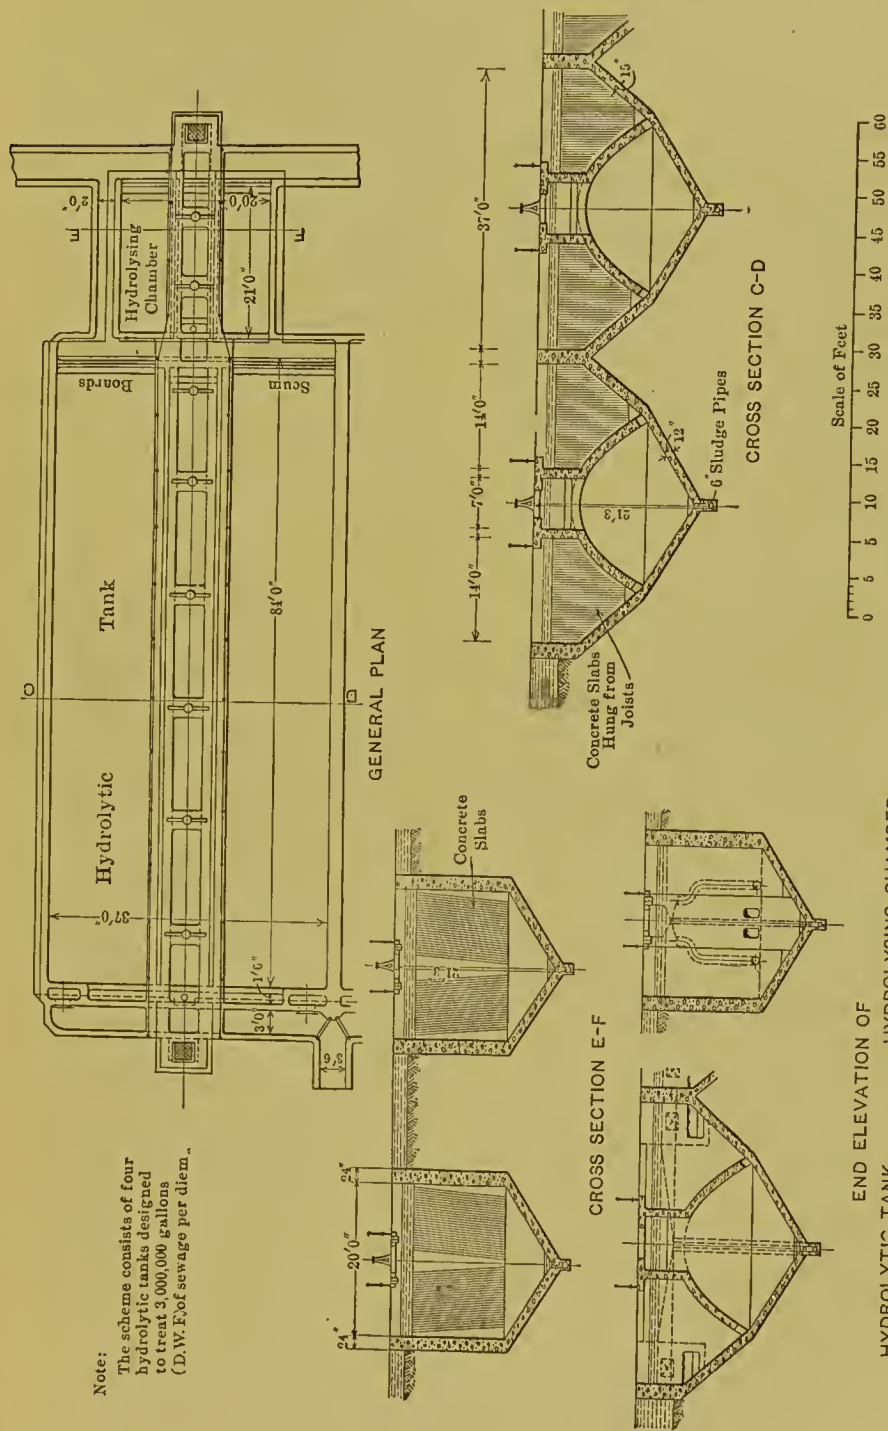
Plan and Section of Hydrolytic Tank and Hydrolyzing Chamber at Norwich (Collins, 1908).
